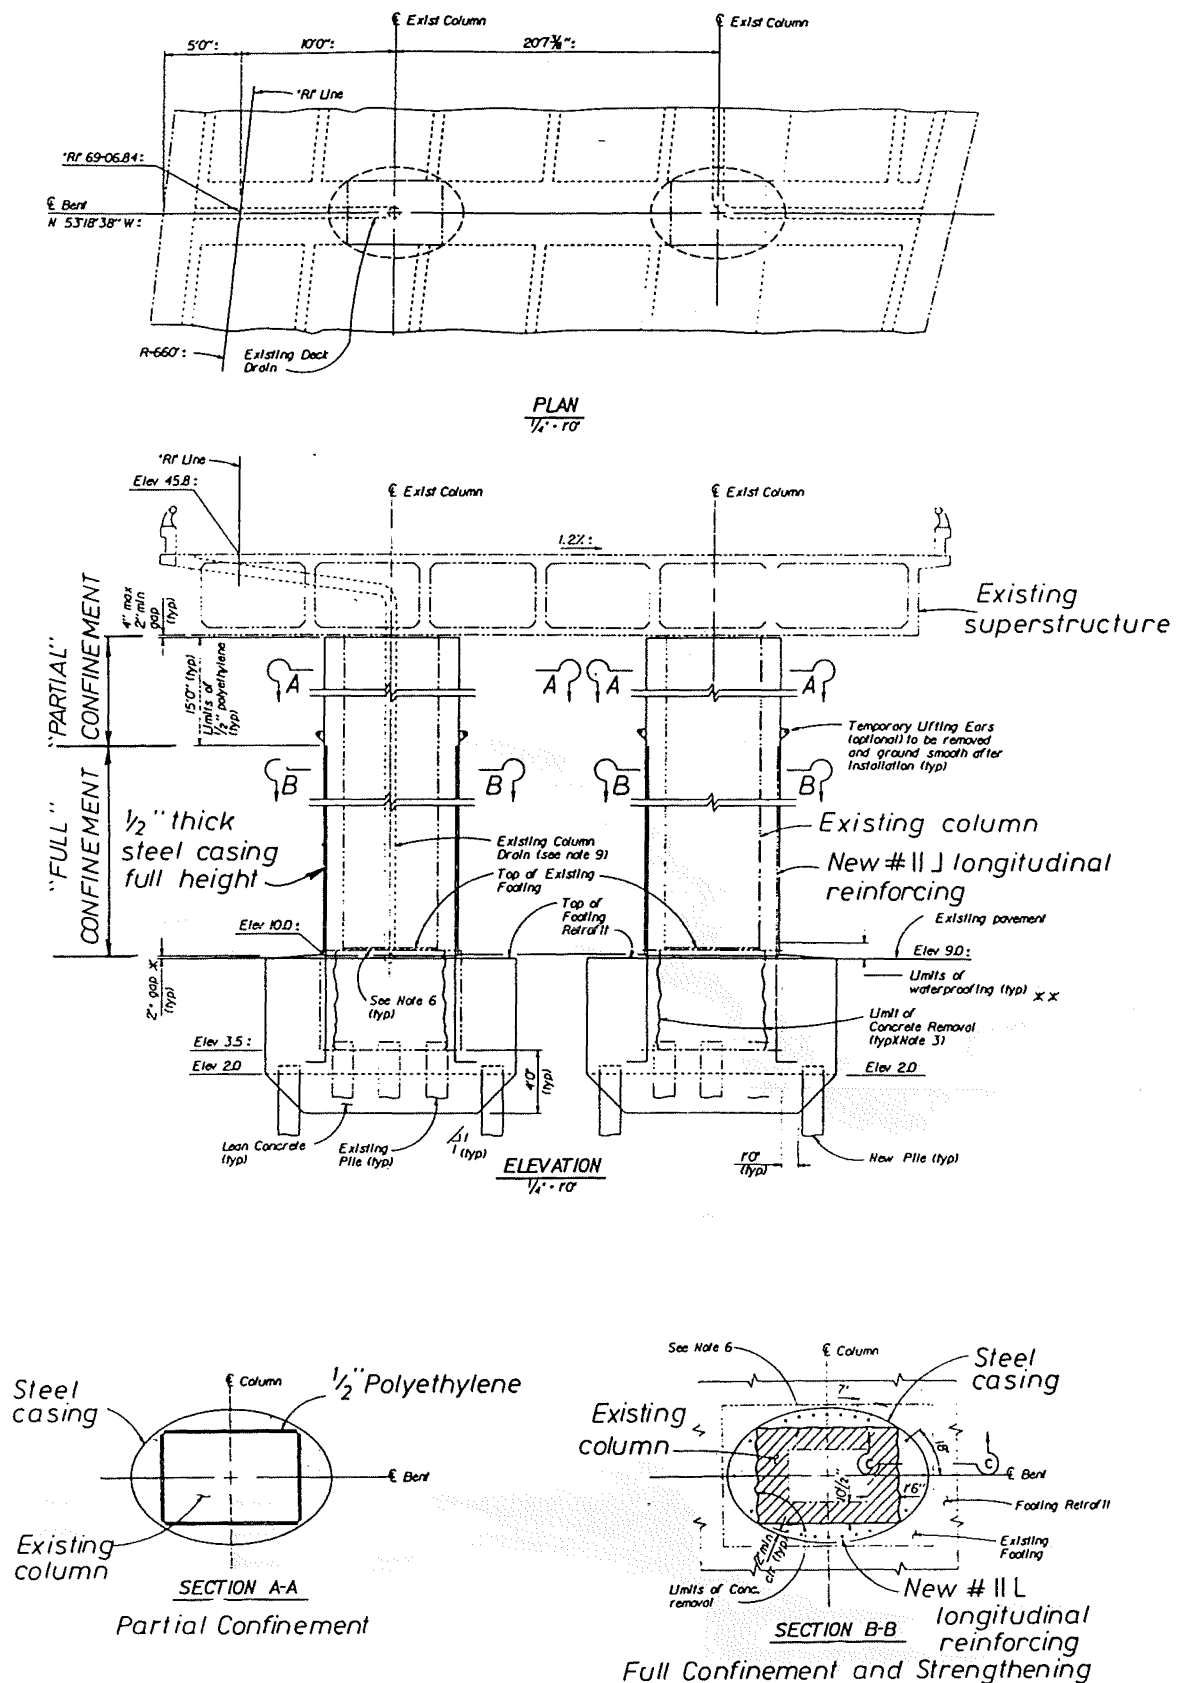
Elliptical steel jacketing column retrofit and strengthening and foundation strengthening, for a two-column pier having rectangular columns [Zelinski 1993].
